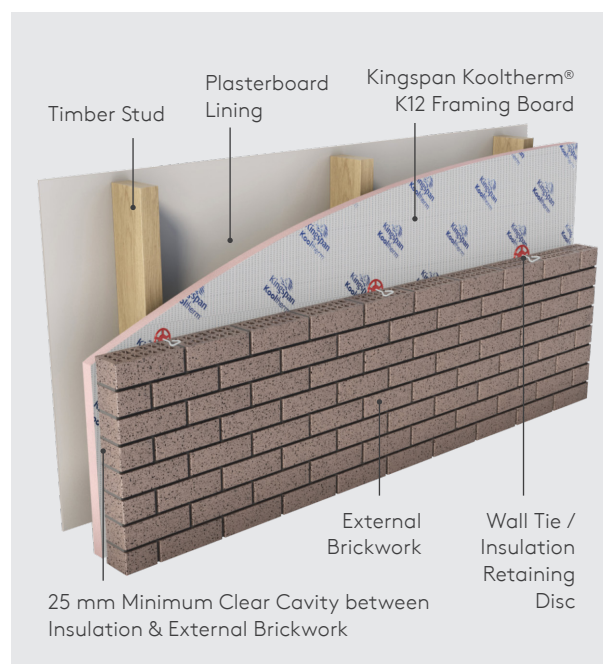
Brick Veneer Installation with Kingspan Kooltherm® K12 Framing Board installed on External Side of Timber Framing.
